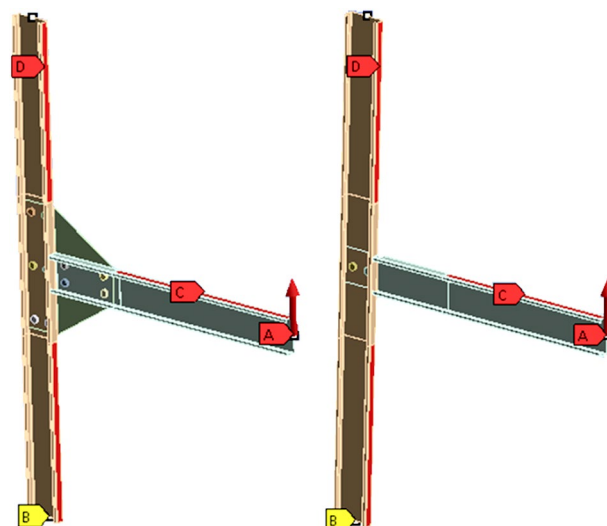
Numerical simulation models. Bolted connection with gusset plate on the left; without gusset plate on the right (A – load point, B – hinged supports on the top and on the bottom of the columns, C and D – lateral supports)
